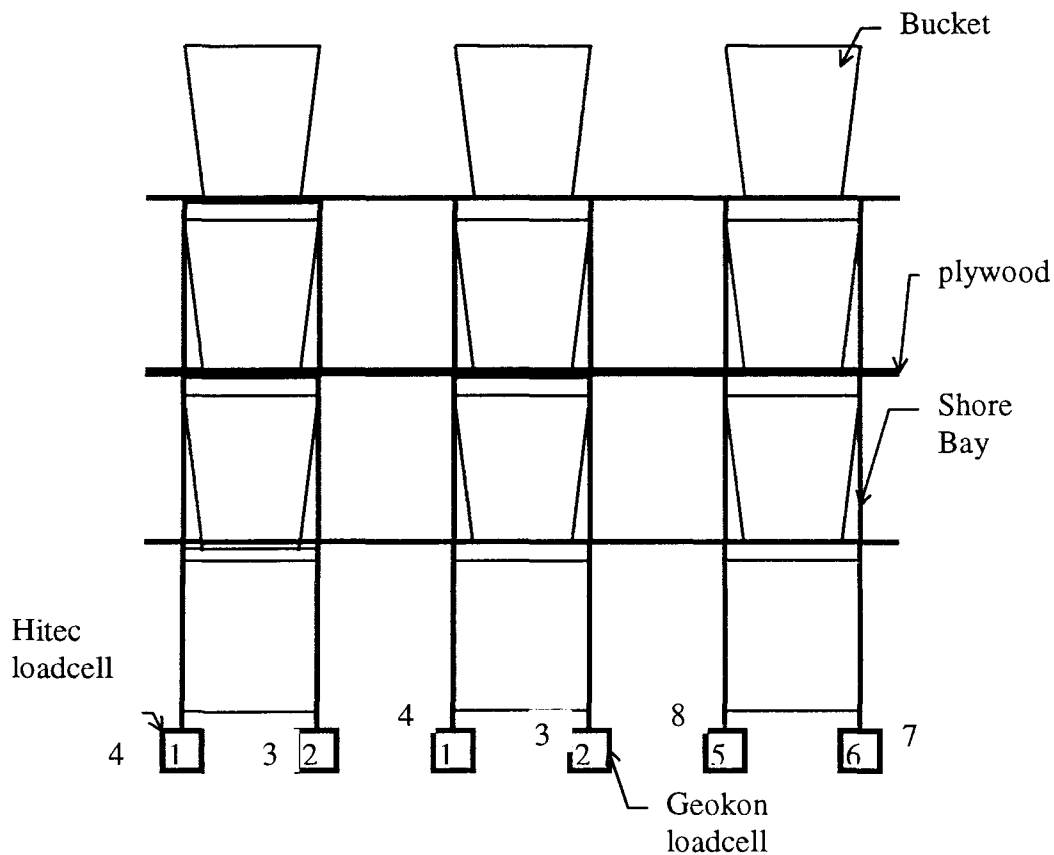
Three story, three bay slab-shoring system model without beams.
